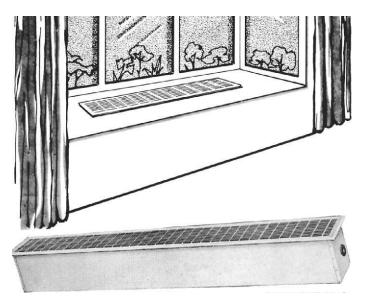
Typical floor recessed unit. (Courtesy Weil-McLain Co.)
